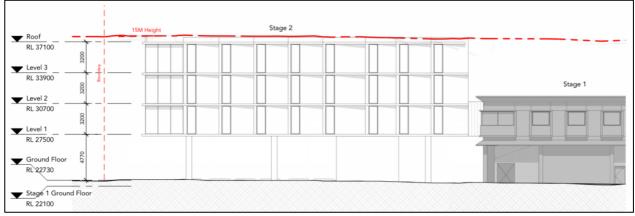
East Elevation View from Lytton Street (Team 2 Architects 2021)
